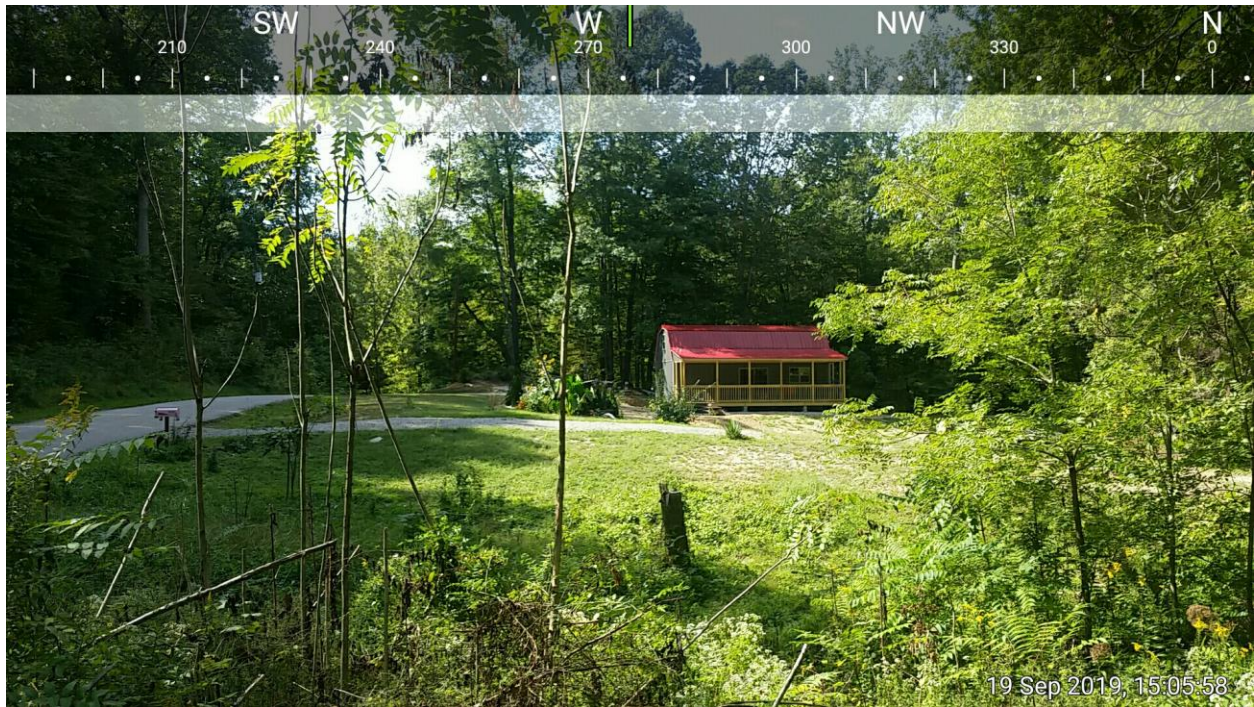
Proposed Lot 1 existing residential storage structure and driveway.
